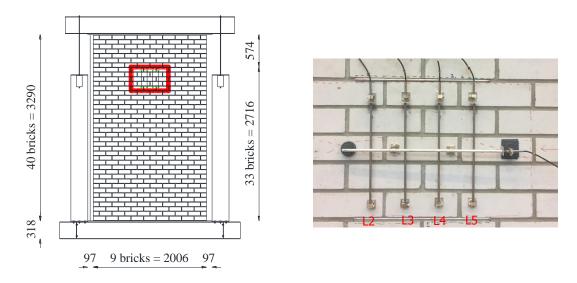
Test set-up for double flatjack test at location 03. The dimensions are in mm.
